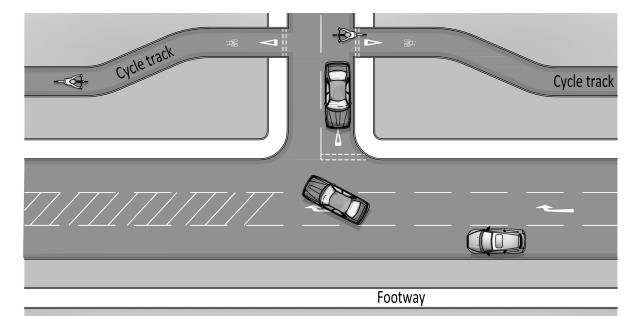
N Indicative layout of a bent-out crossing at a minor road
